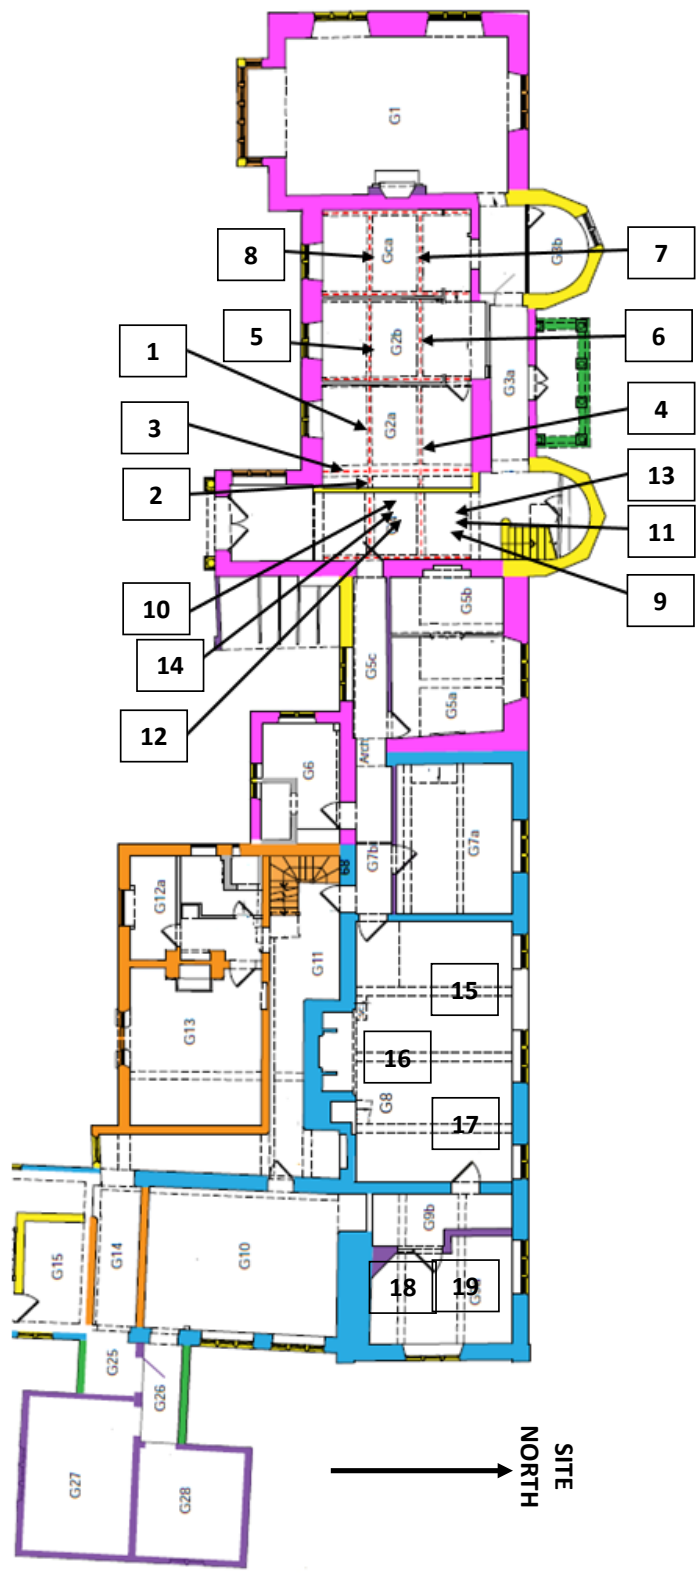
Ground-floor plan of the hall range and the kitchen/service range, including room numbers, to locate sampled timbers (after Worcestershire Archaeology 2019)
